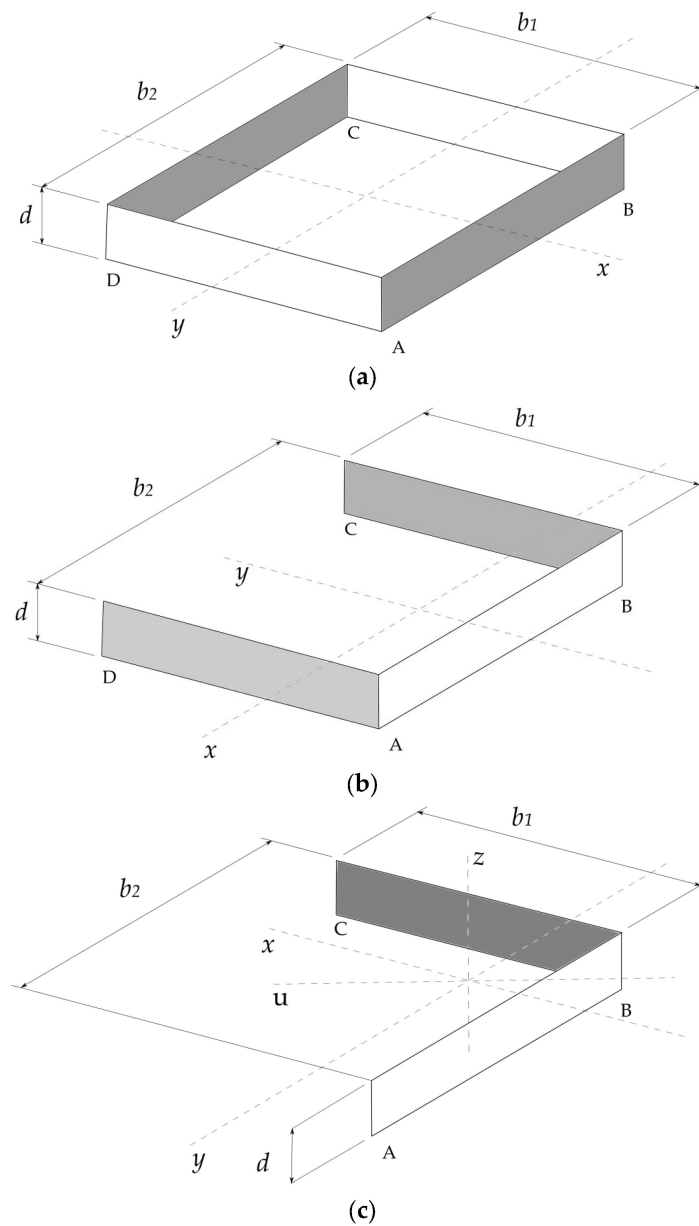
Critical perimeter of an interior, edge and corner slab–column connections, modified from Ref. [1]: (a) interior slab–column connection; (b) edge slab–column connection; (c) corner slab–column connection.
